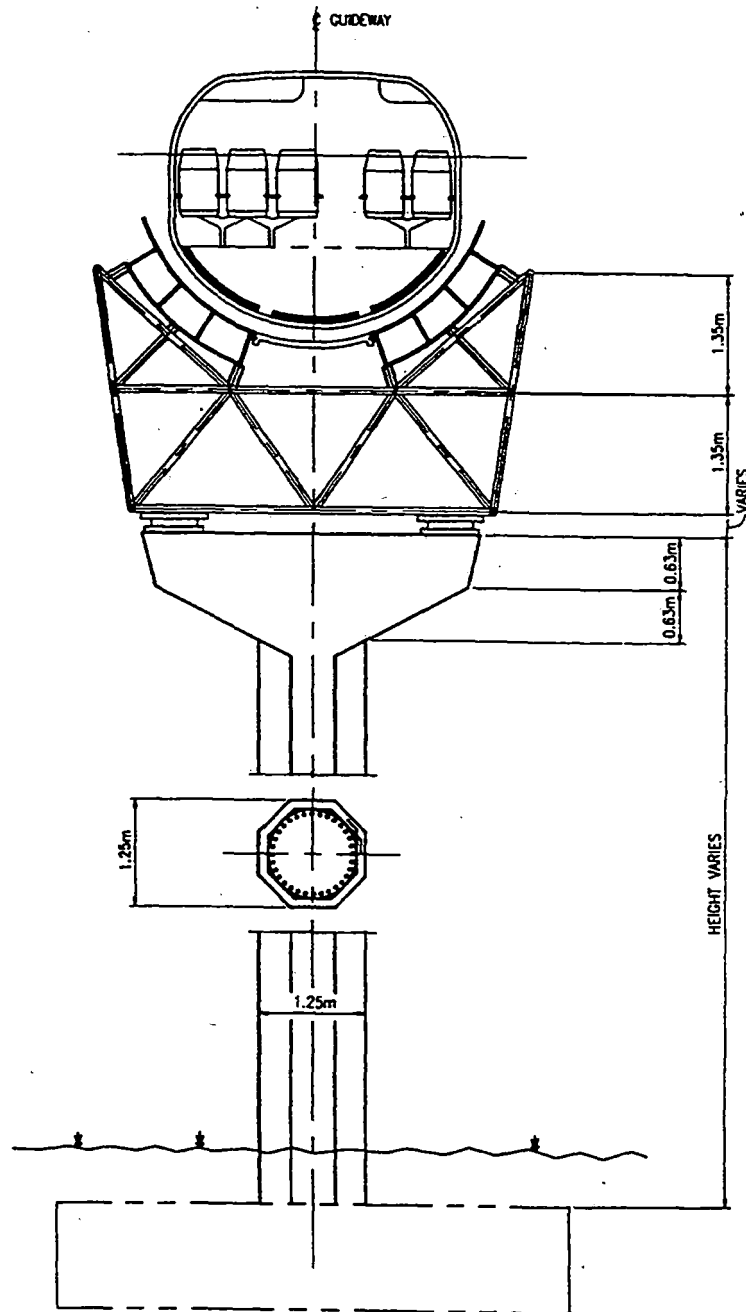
Concrete crossbeam and columns supporting an aluminum magway
